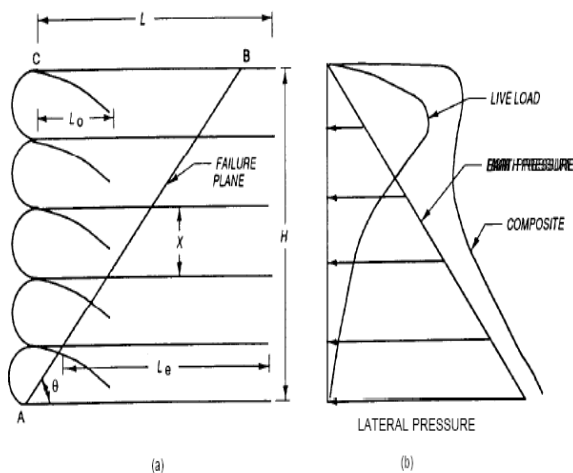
General Configuration of a Geotextile Retained Soil Wall and Typical Pressure Diagrams
